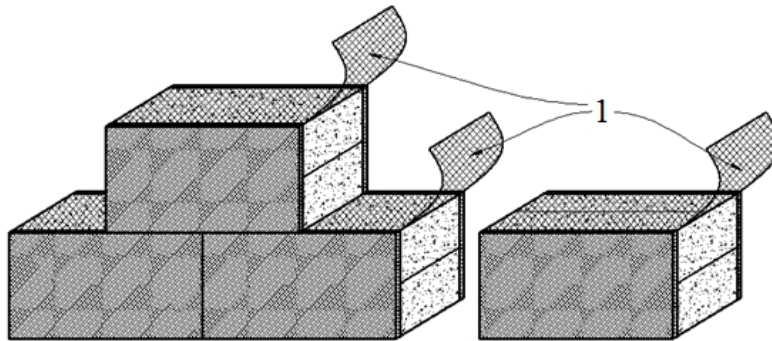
Masonry weaving using reinforcement mesh around the horizontal joints,
